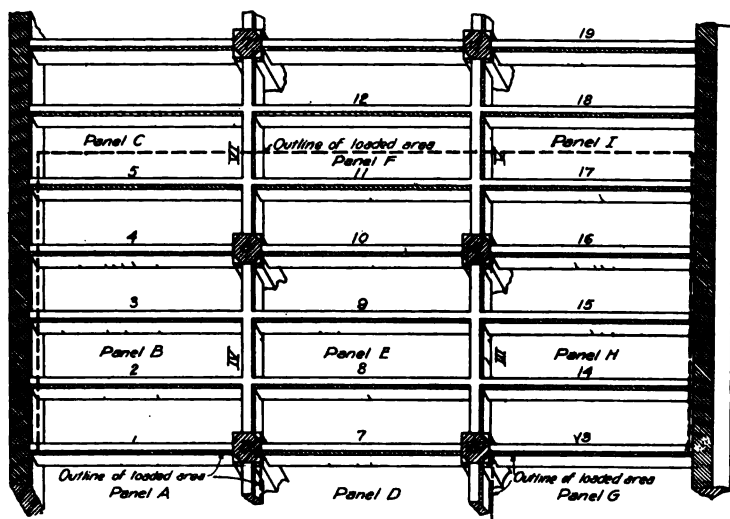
CABINET PROJECTION SHOWING BEAMS AND GIRDERS AND POSITION OF TEST CRACKS.
